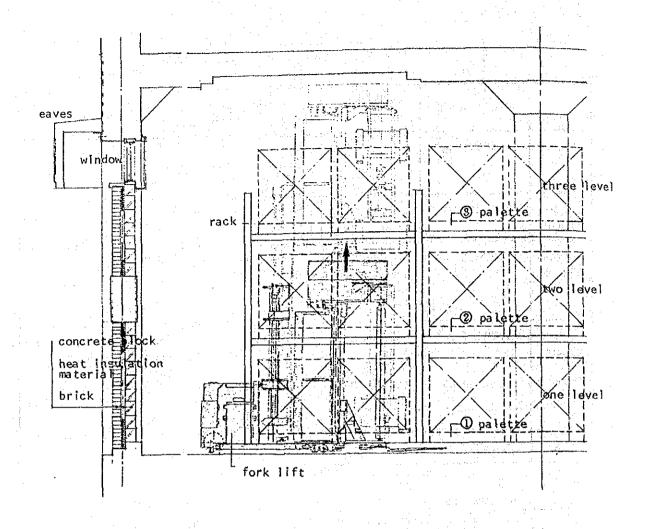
Relation Among Floor Height, Fork-Lift and Rack
